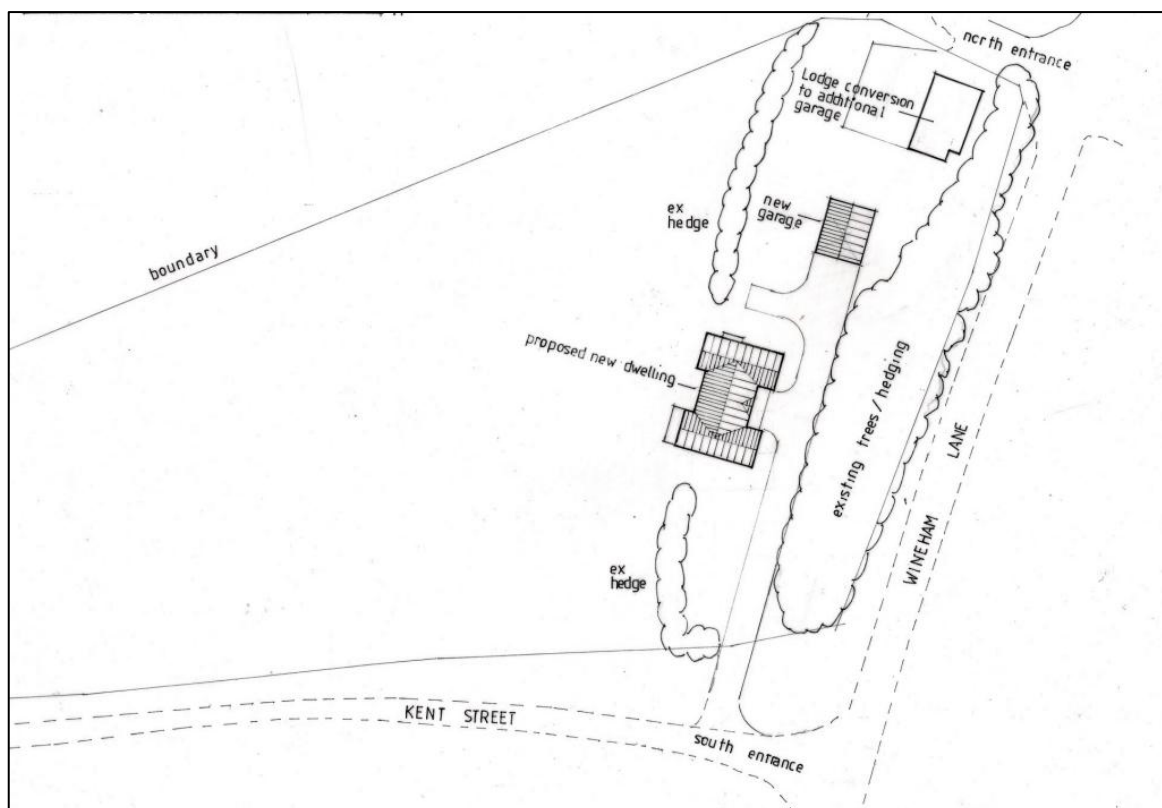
Approved Site Plan for Application Reference DC/20/0079
